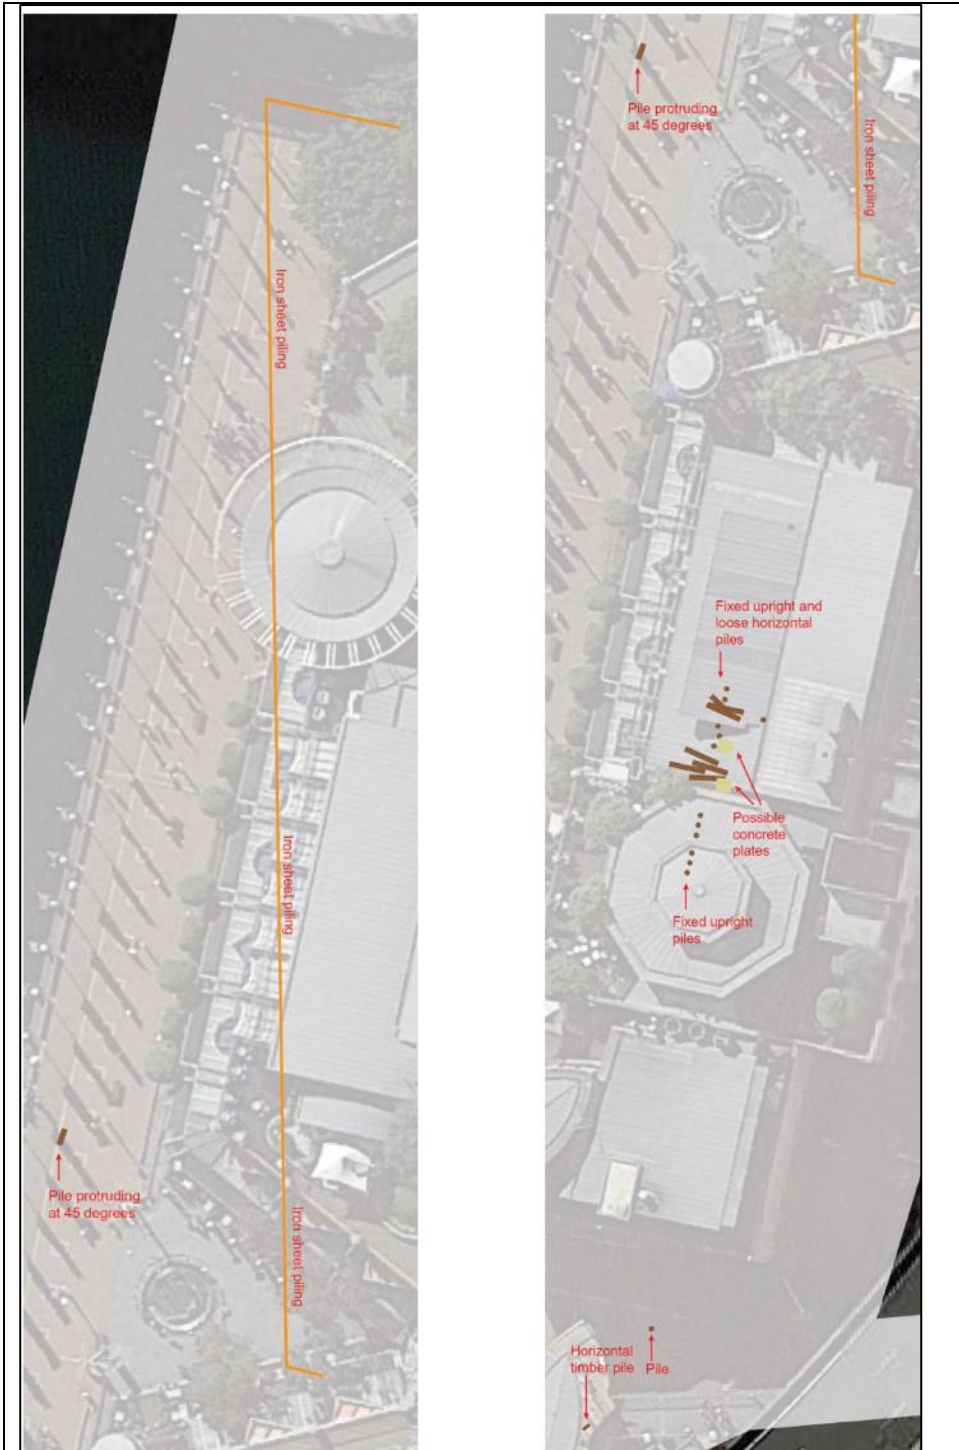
Known sheet piling (left) and Known timber sheet piling and potential wharf remains.
